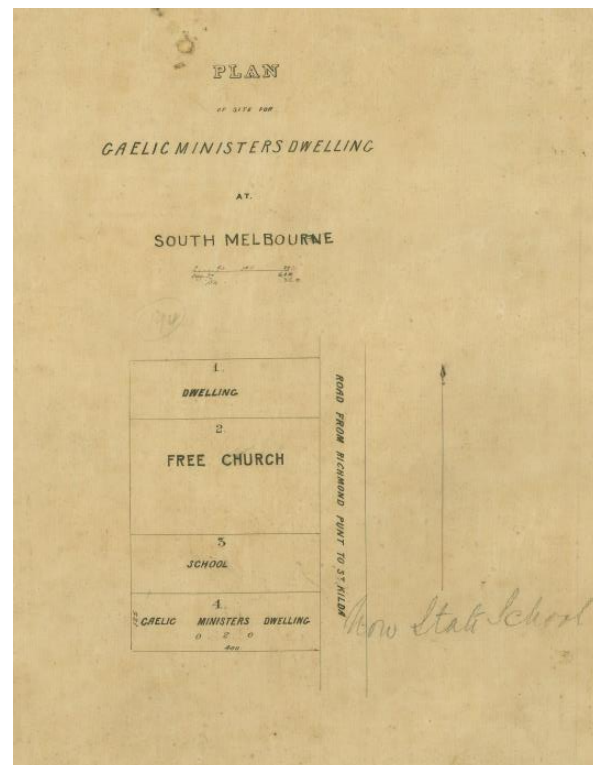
Plan for a Gaelic Minister’s Dwelling at South Melbourne, 1854. (Source: VRPS 8168, P0005, Item 195, Historic Plans Collection, PROV)
